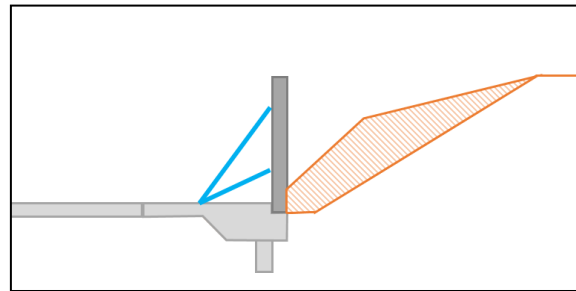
Stages 4 – backfill behind retaining wall
